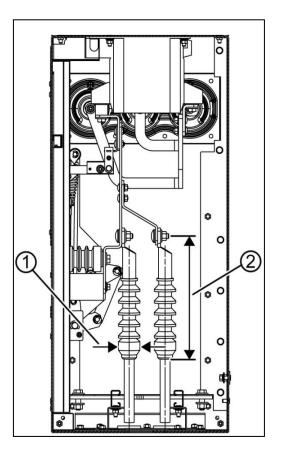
Dimensions of single-core cables in contactor panel with panel width 435 mm (rear view)
